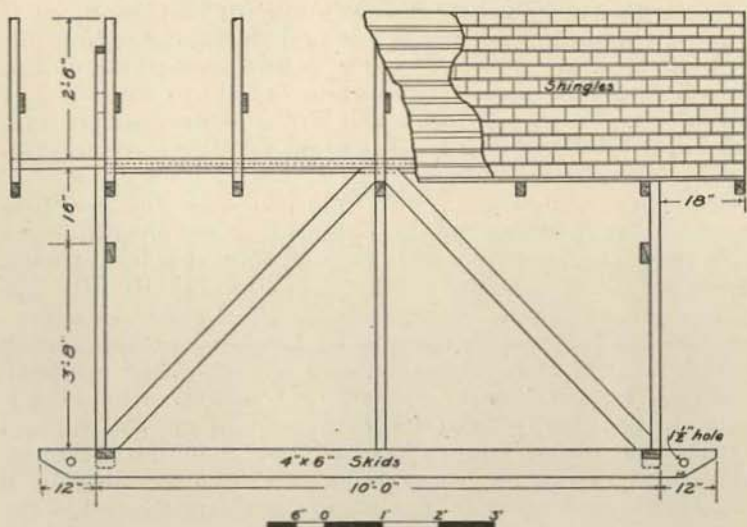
SIDE ELEVATION. OPEN AIR RANGE HOUSE.
